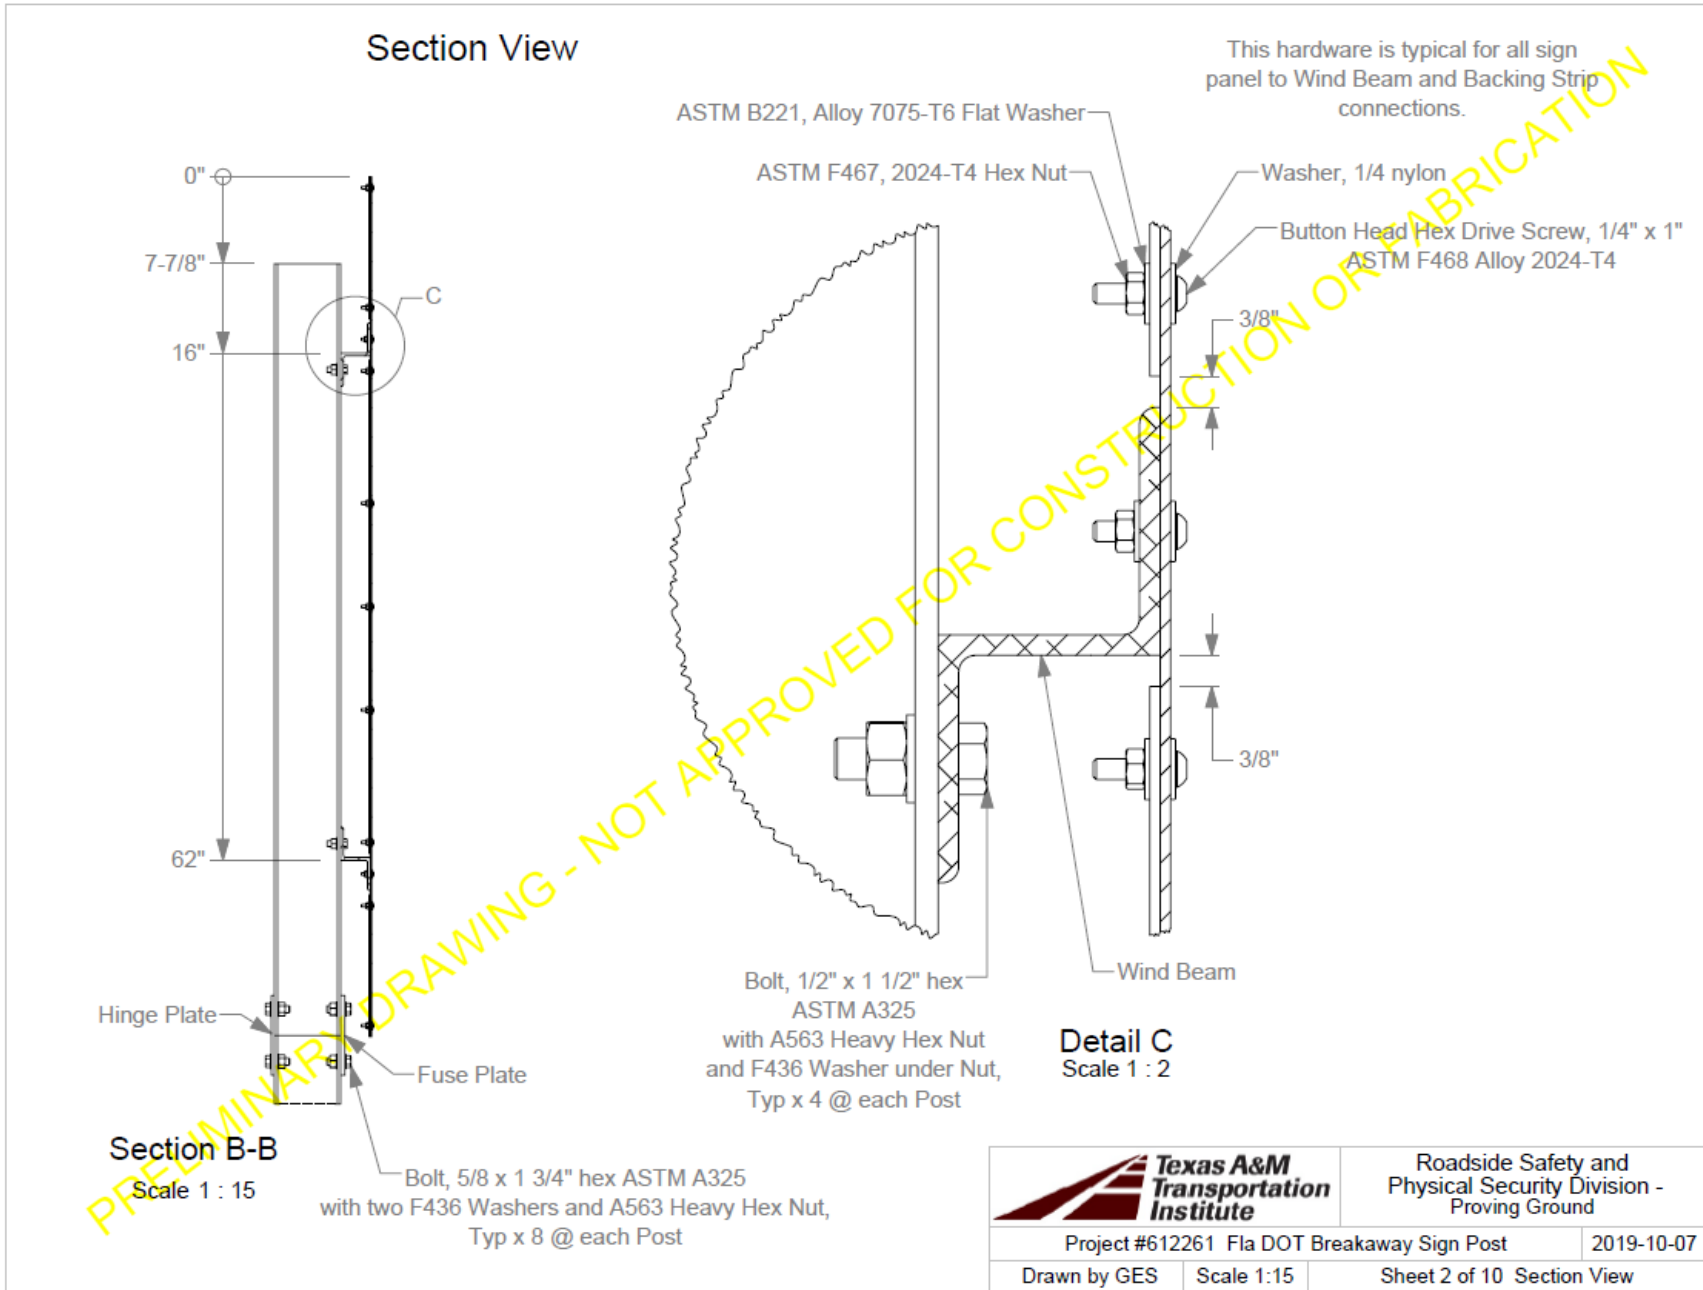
Preliminary Drawing (Sheet 2 of 10).
